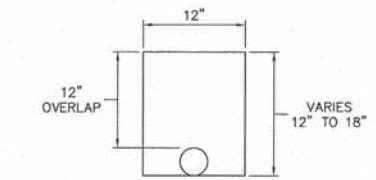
DETAIL: LOCATION OF PEDESTRIAN RAILING END POST
